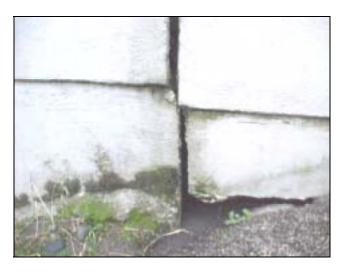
Side view of joint between the end panel and the adjacent slab before slab jacking
